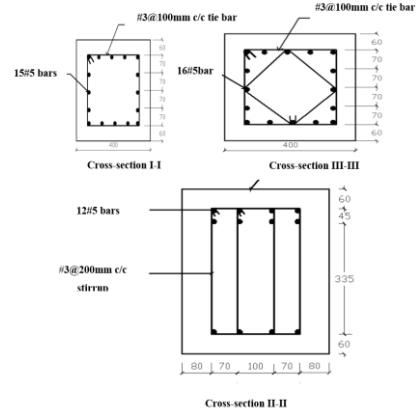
Cross-section of beam and column portion (all dimensions in mm).
